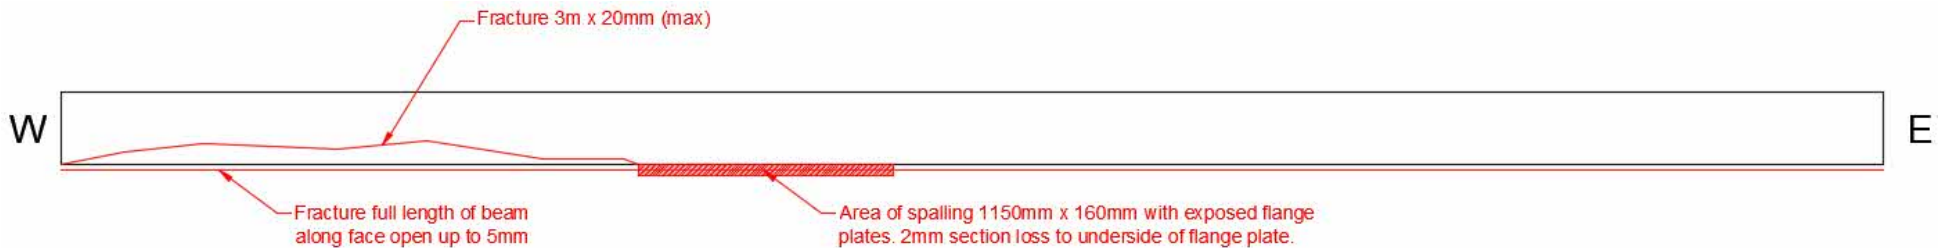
Plan View of Beam No.1 Defects (Photograph 7)
